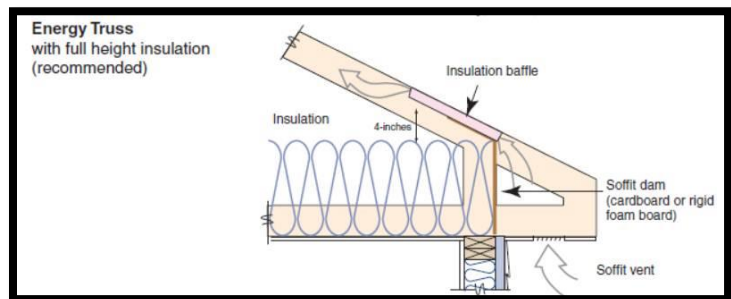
Raised heel (energy) truss with attic space. Source: [Attic Eave Minimum Insulation | Building America Solution Center \(pnnl.gov\)](#)
